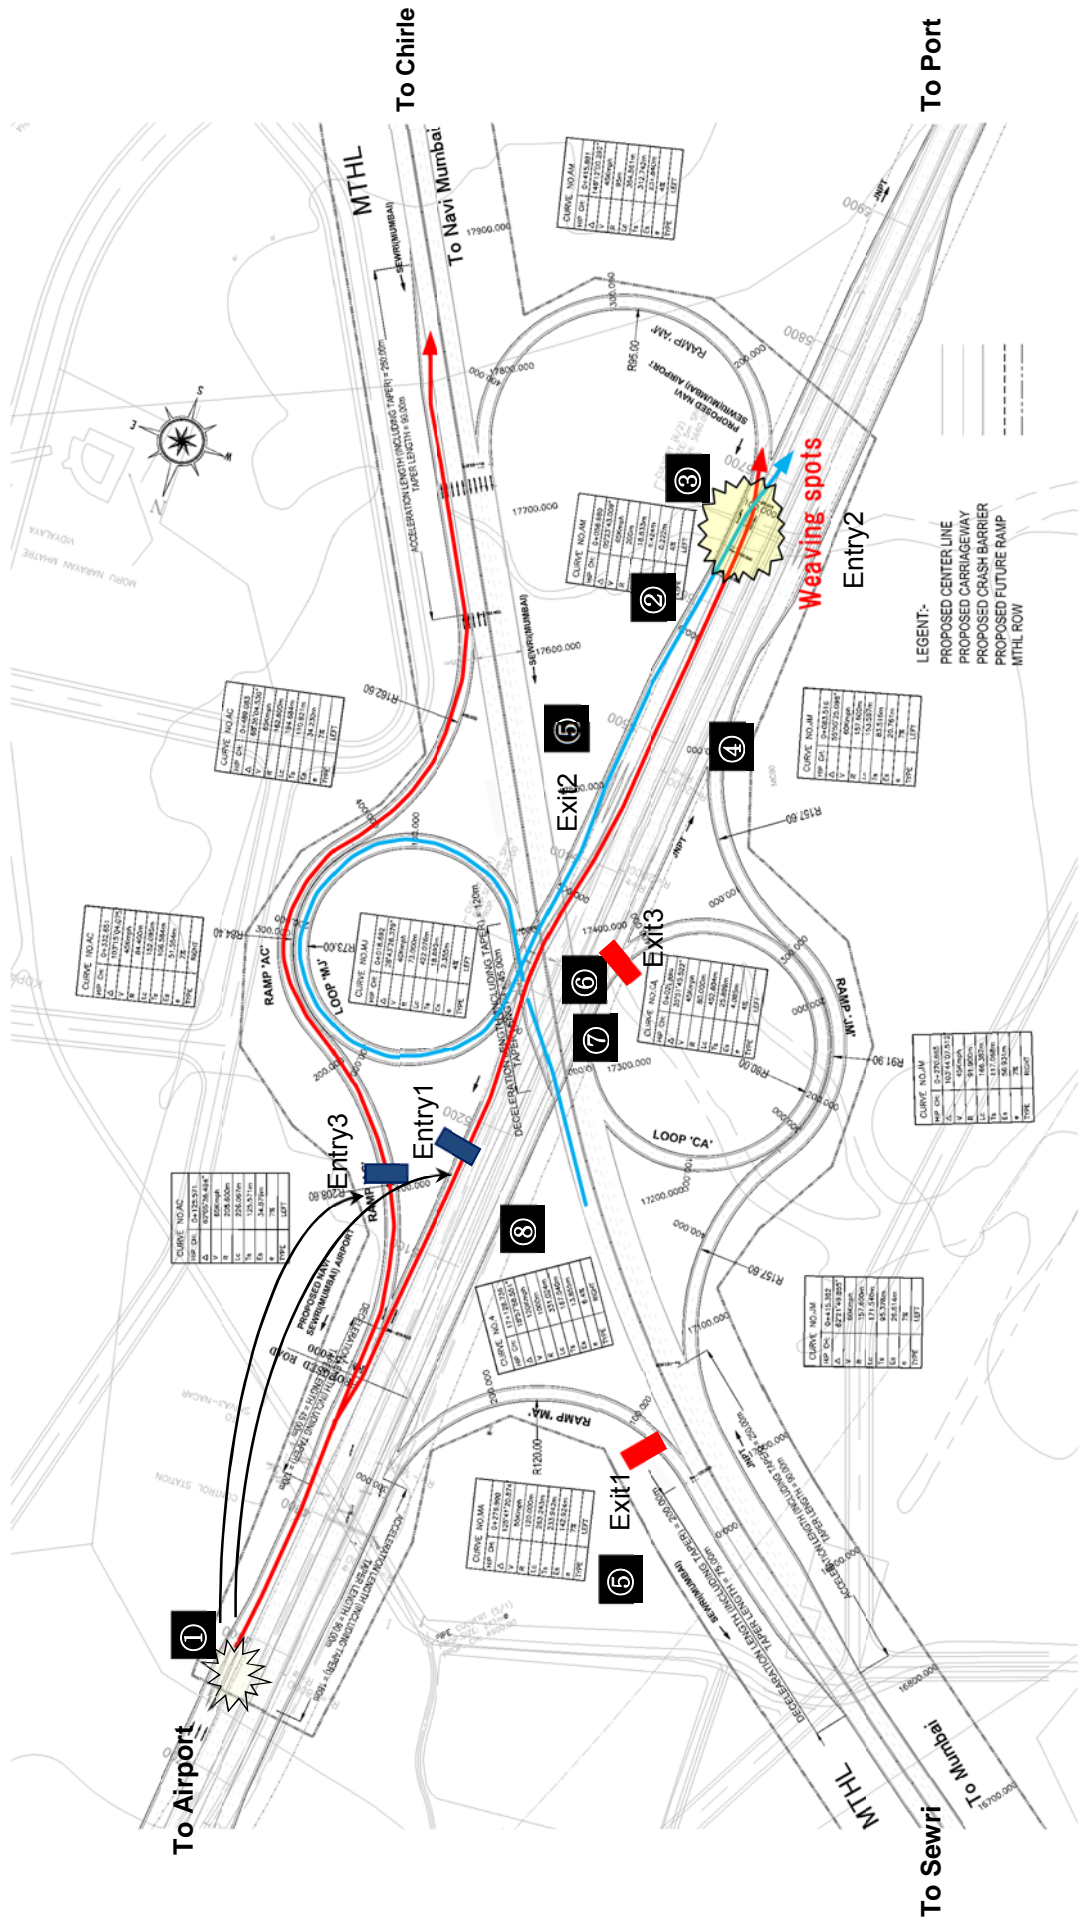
Arrangement Plan at Shivajinagar IC (Reference)
